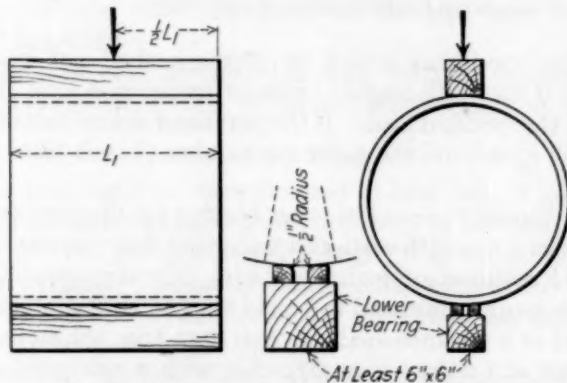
Three-Edge Bearings for Pipe Without Bell End.
